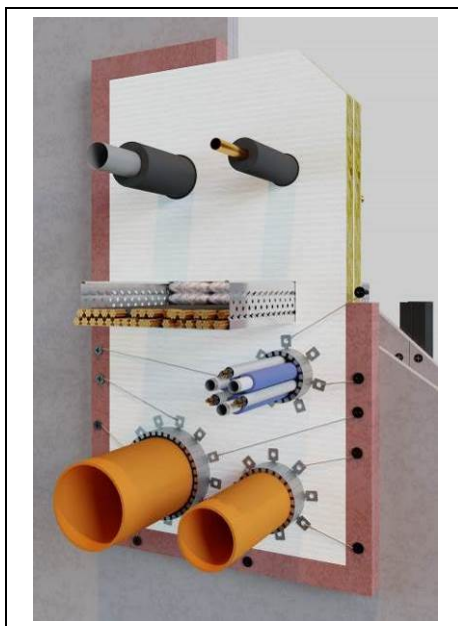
Example of AF PANEL seal in a lining wall EI 60.
